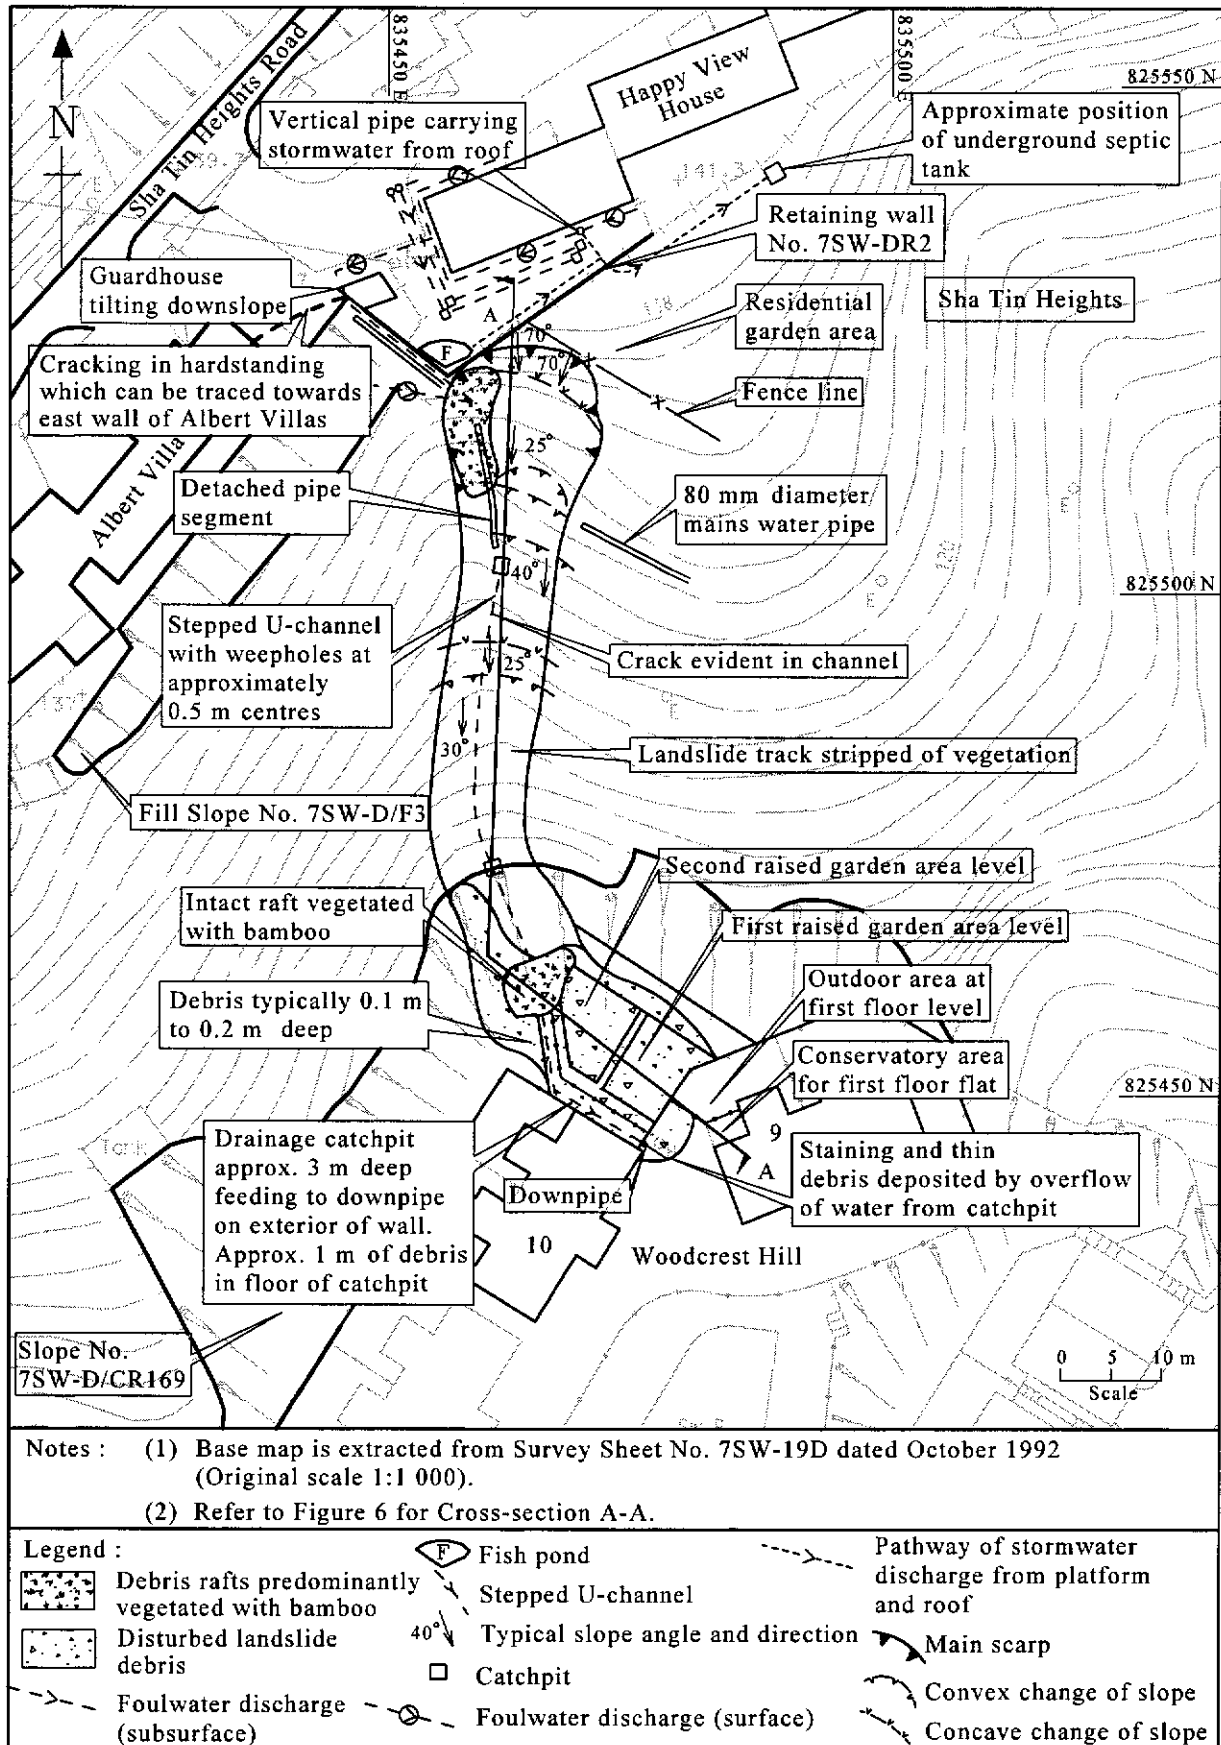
Site Plan and Details of Landslide Incident No. MW97/6/12
